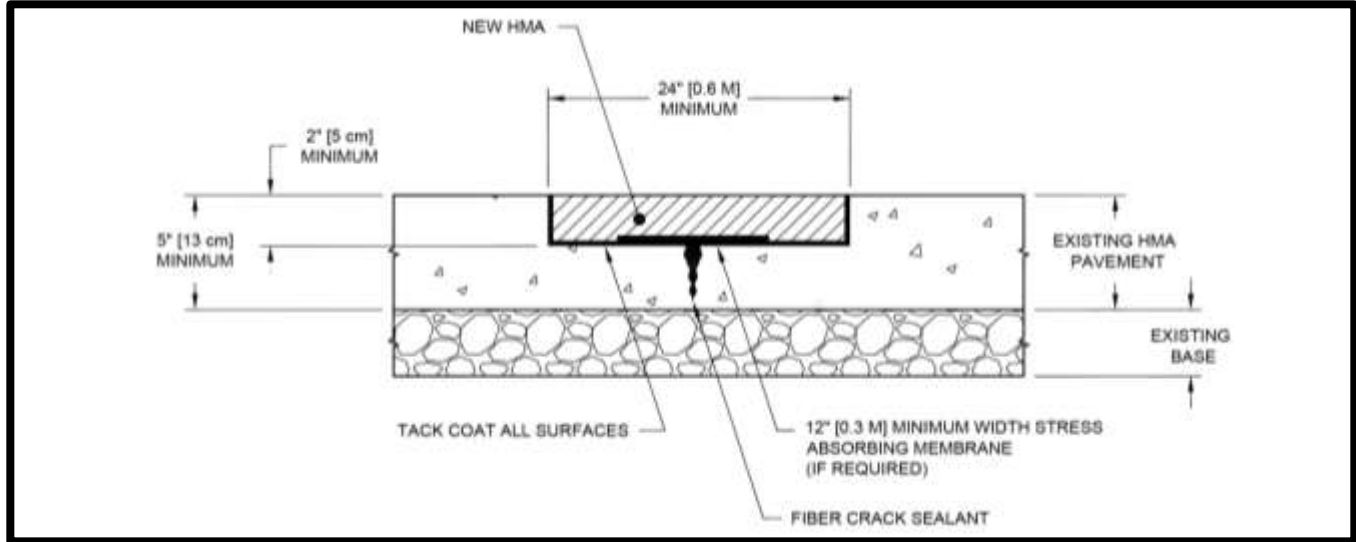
Partial depth crack repair in flexible pavement
